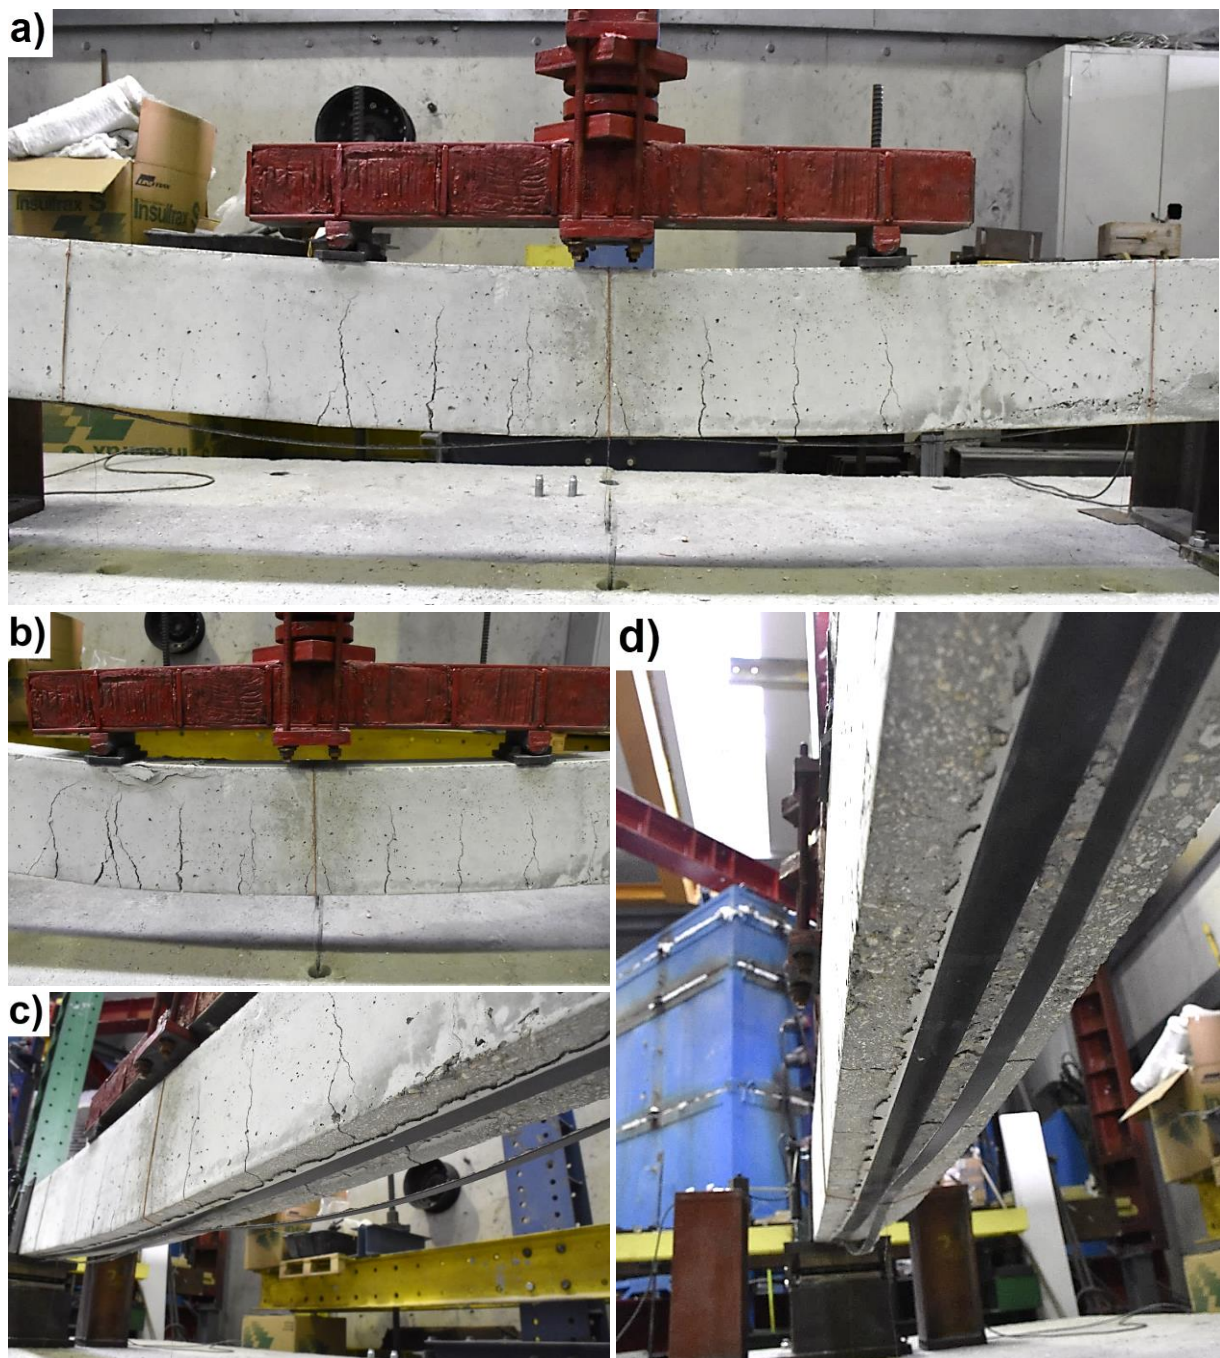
(a-d) Deformed shape of strengthened beam after complete debonding and delamination of laminate with excessive deflection and cracking
